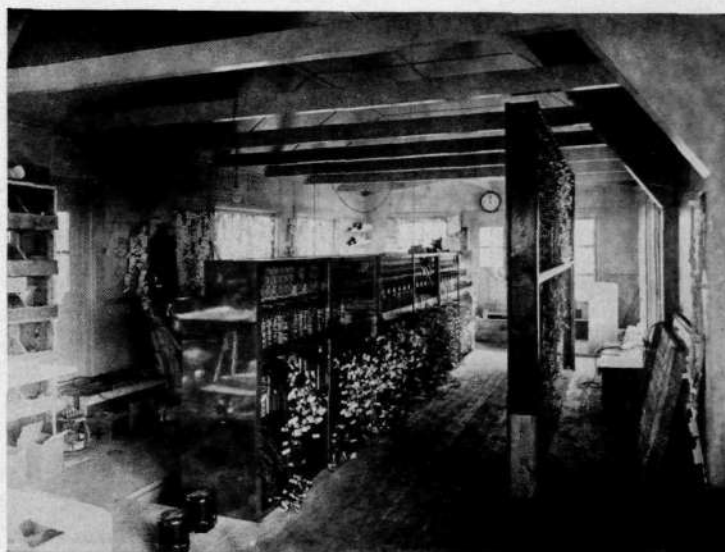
Fitting of the interlocking frame and illuminated track plan, back view.
